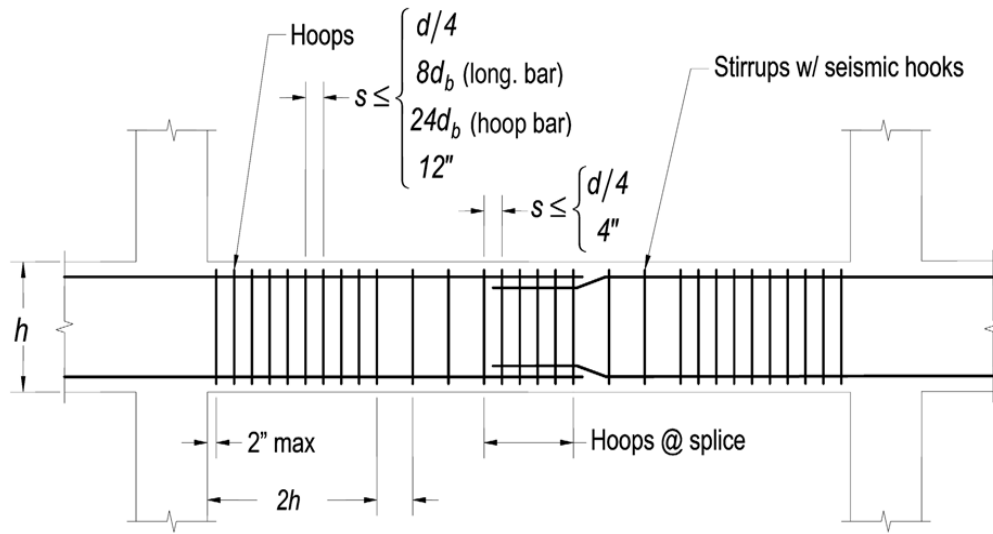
Hoop and stirrup location and spacing requirements.
